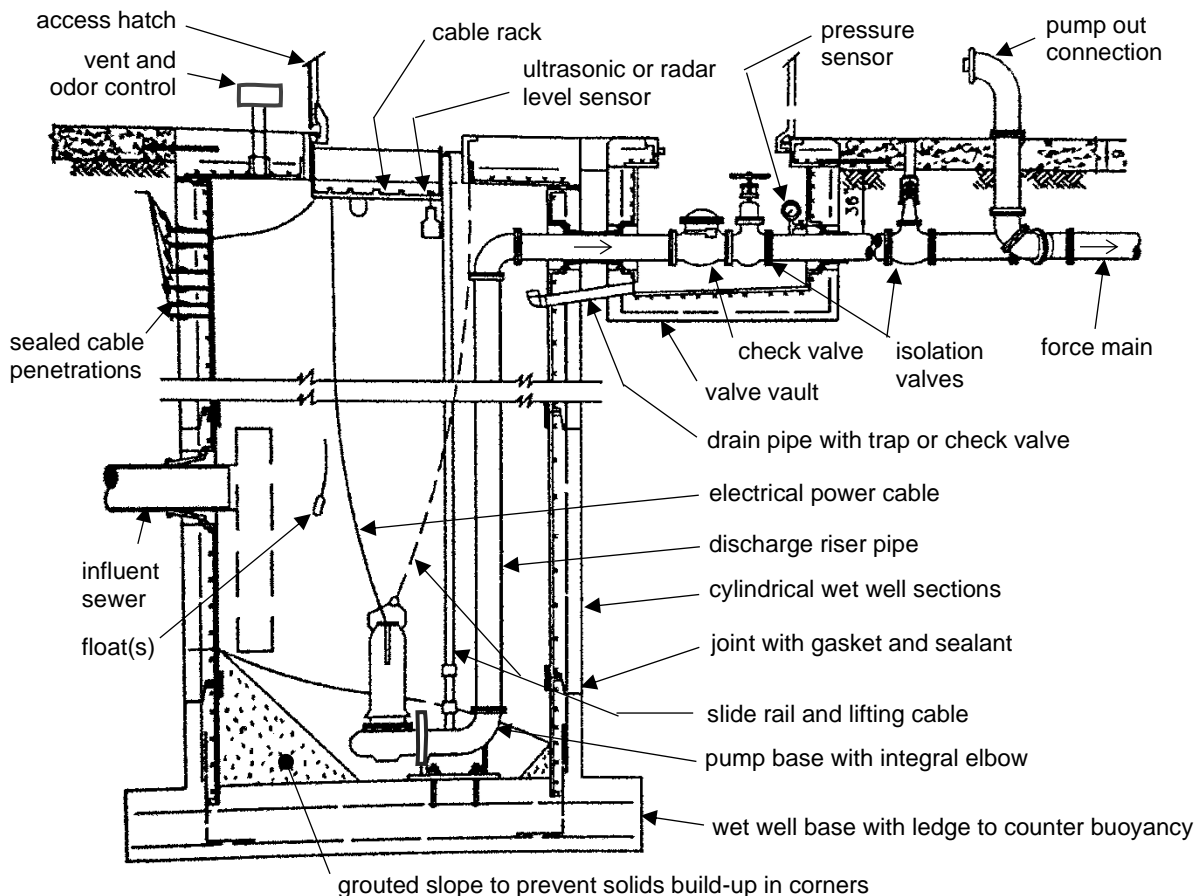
Section of a submersible lift station with a precast concrete wet well and valve vault. Important features are labeled.
